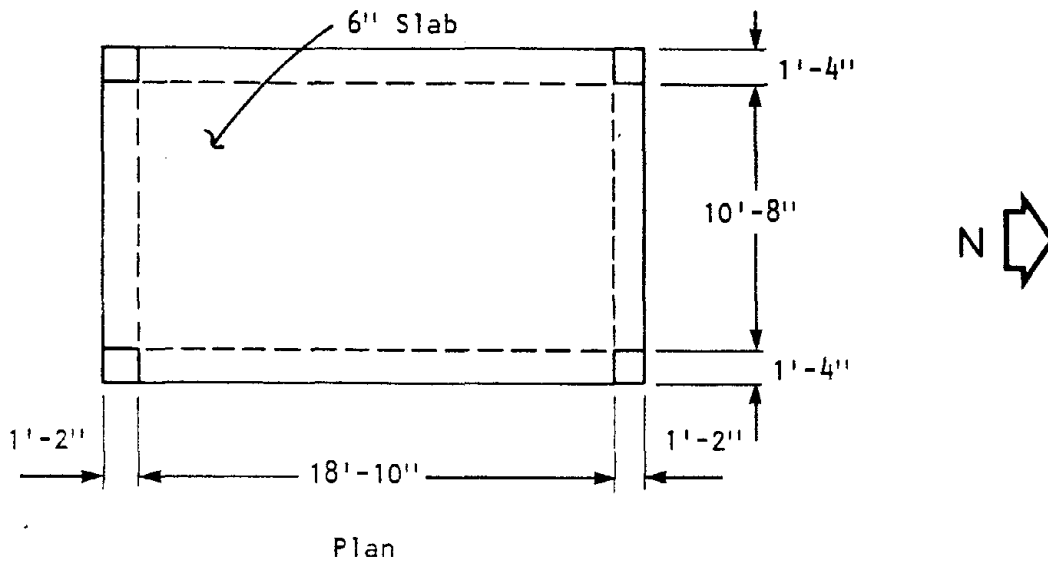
4-STORY CONCRETE TEST STRUCTURE
